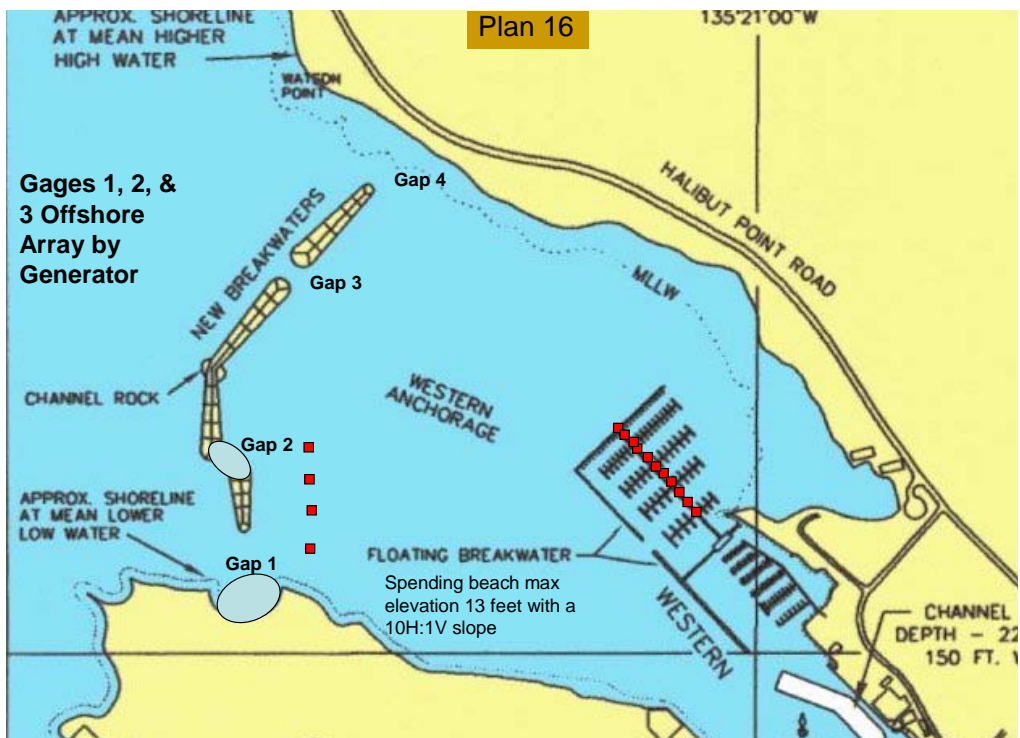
Plan 16 is a combination of Plan 4 and Plan 17.
